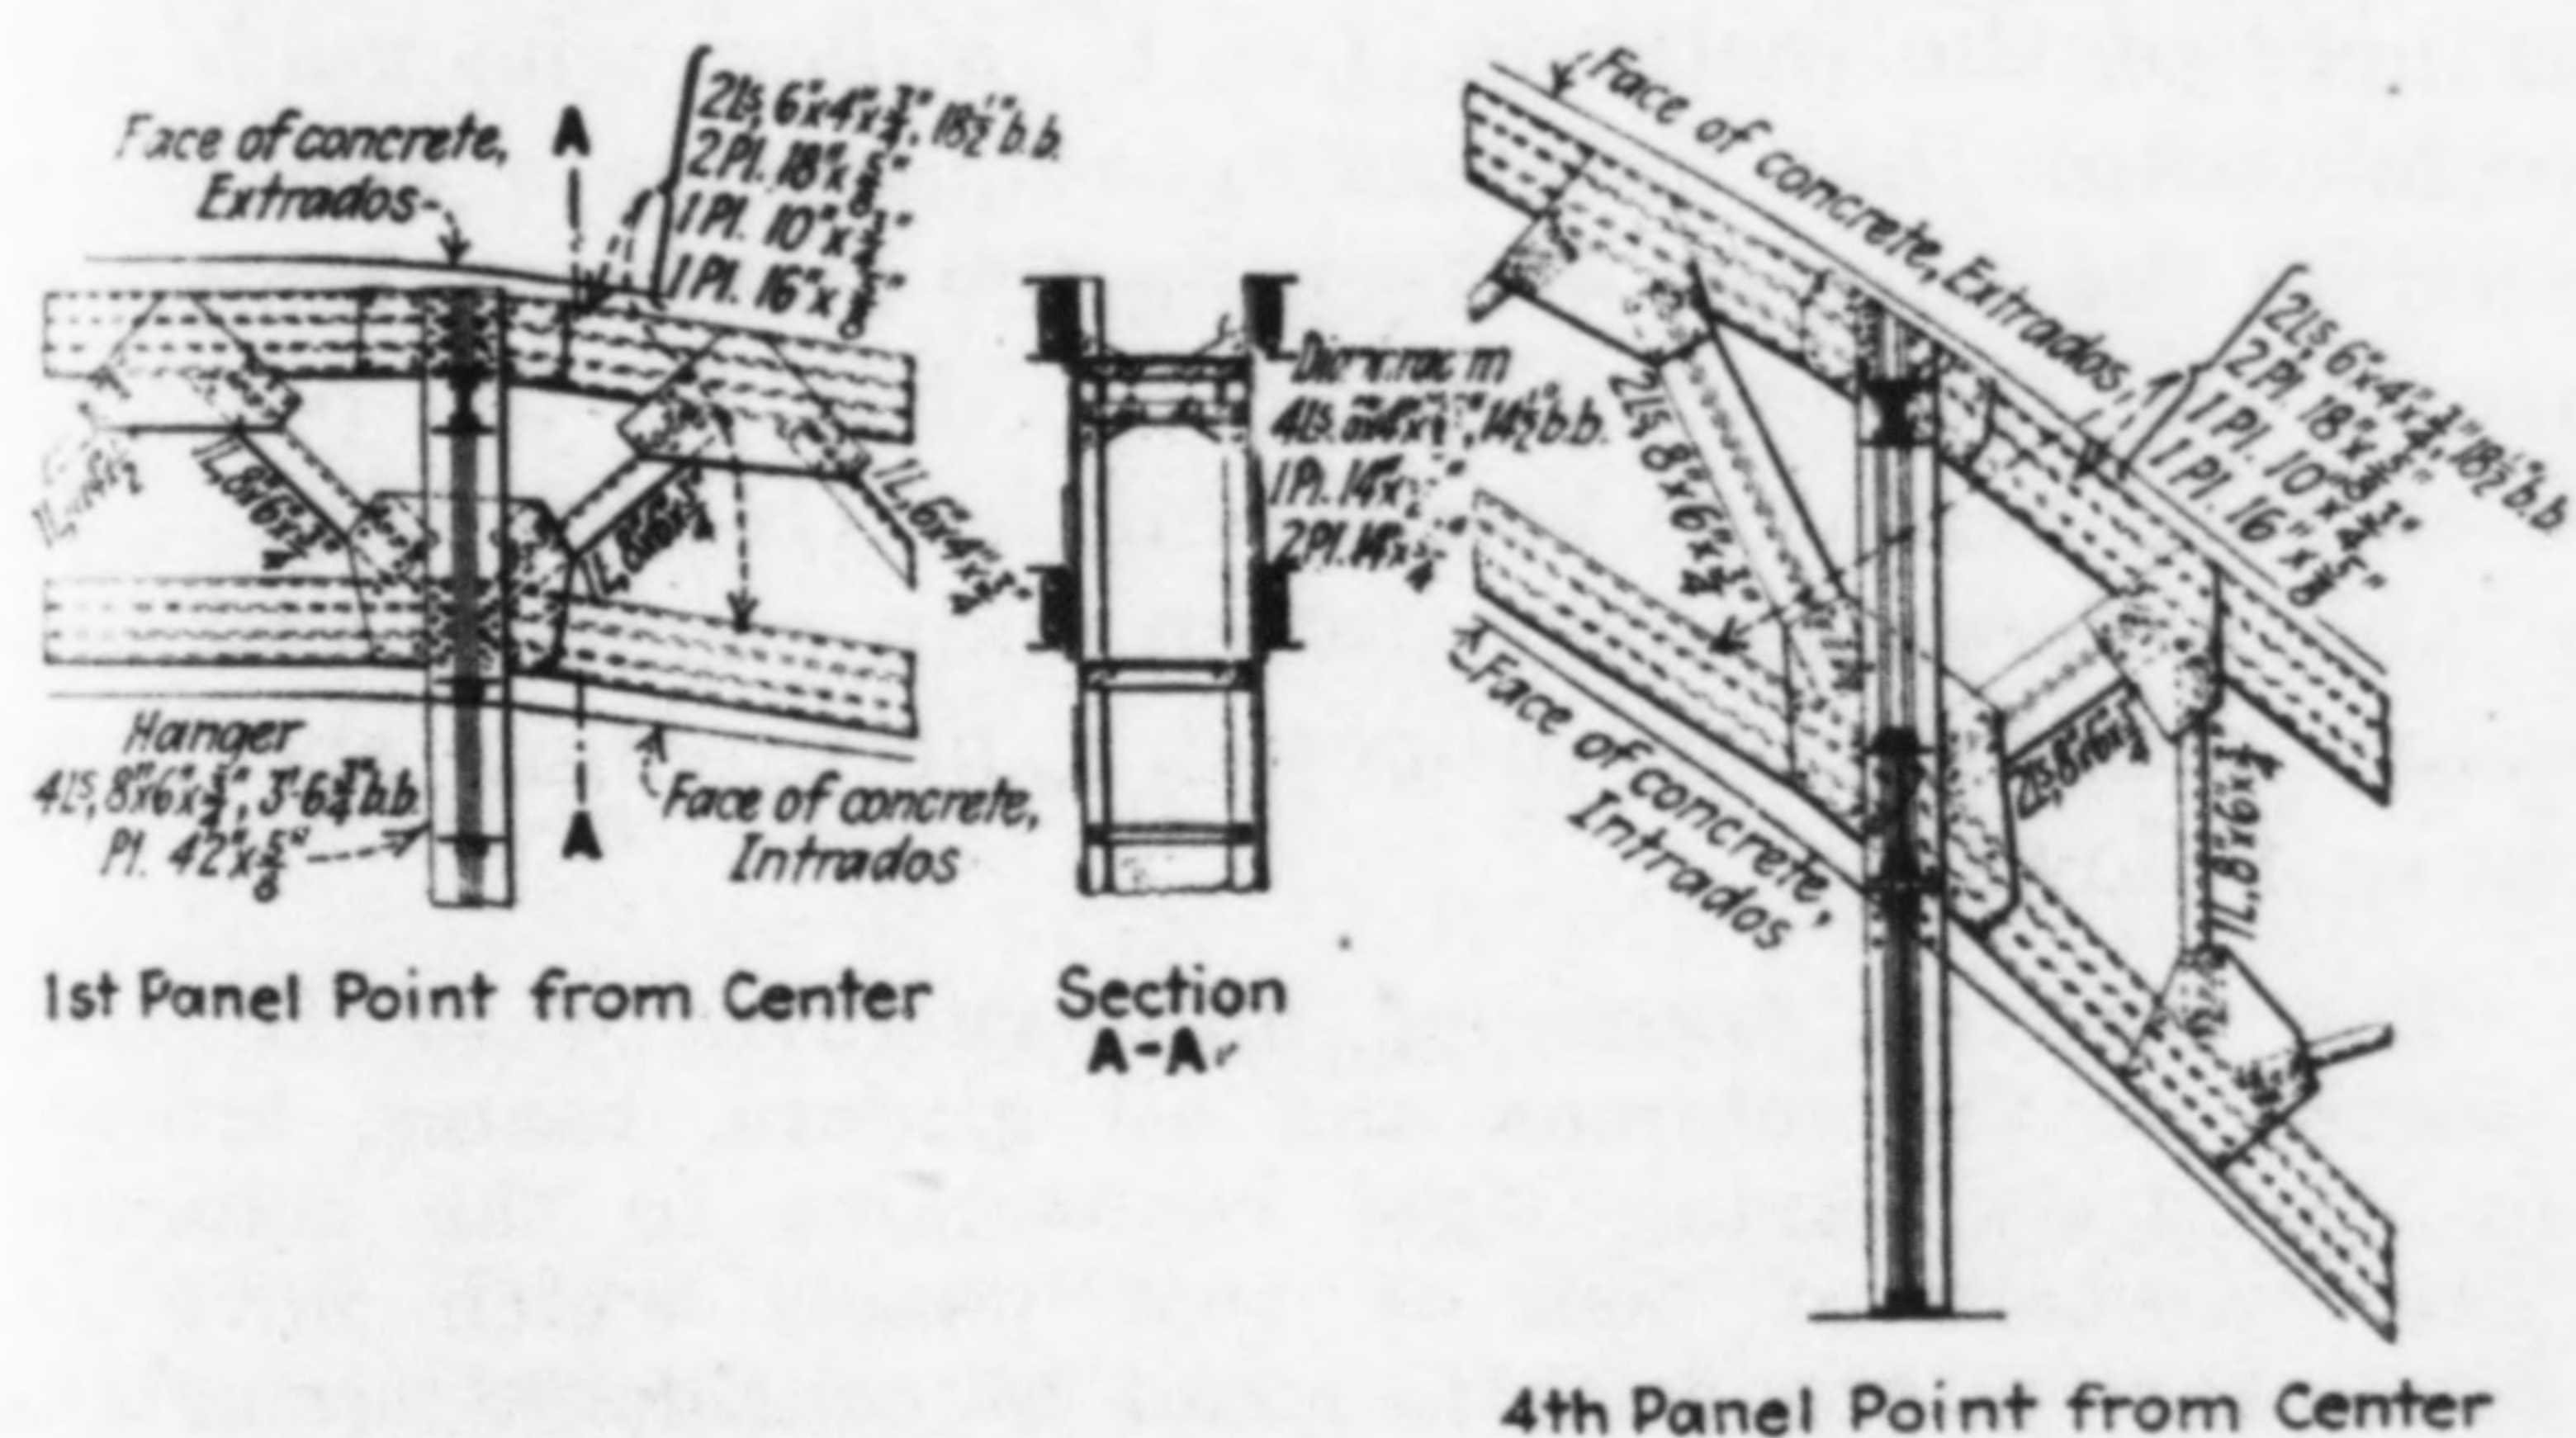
DETAILS OF STRUCTURAL STEEL FRAMING OF ARCH REINFORCEMENT
